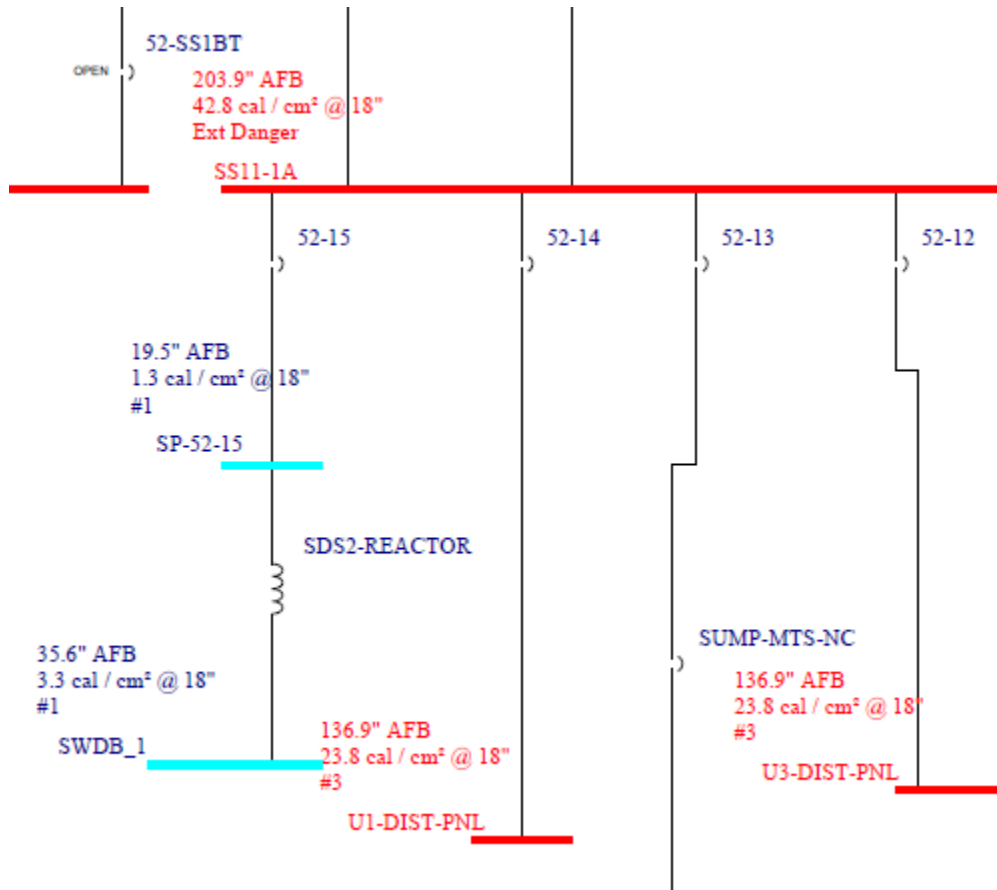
14 – Arc Flash Assessment of Existing 600 V SS1 Switchboard Loads
